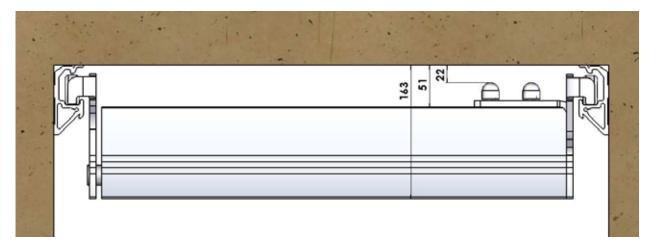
Minimum distance from ceiling to traverse rail for wall mounting
